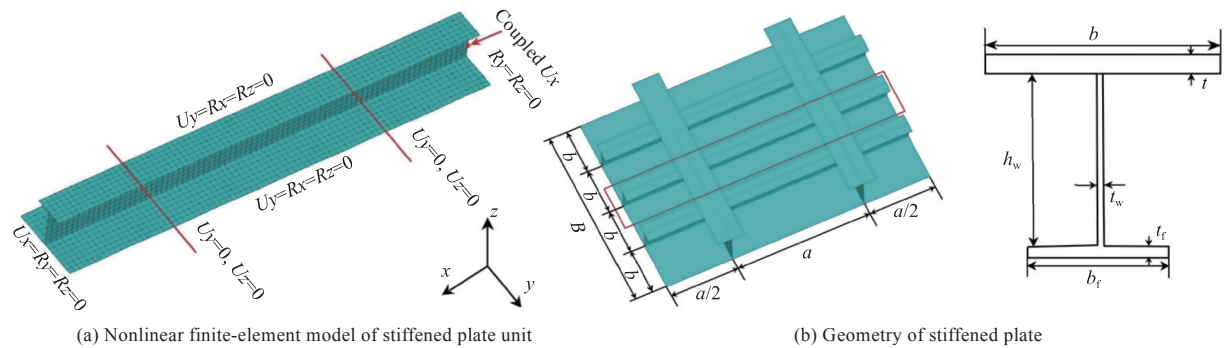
Schematic diagram of stiffened plate unit and stiffened plate structure
